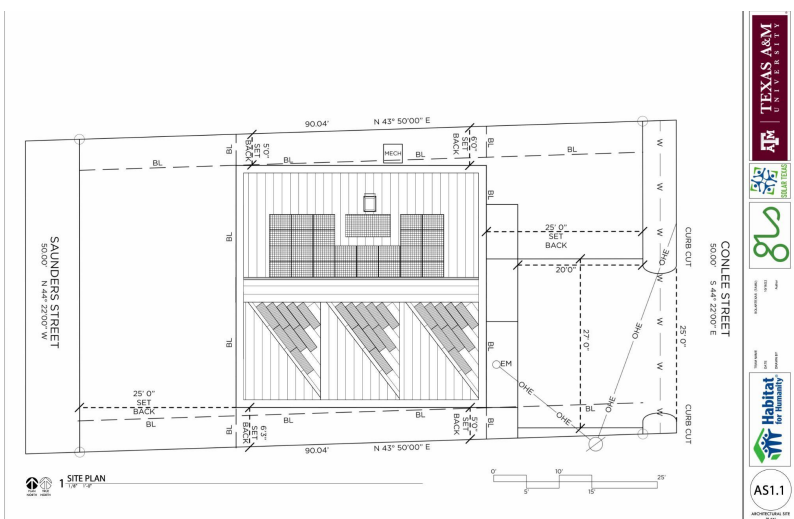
Solar Texas site plan at 1613 Conlee Drive, Bryan, TX
